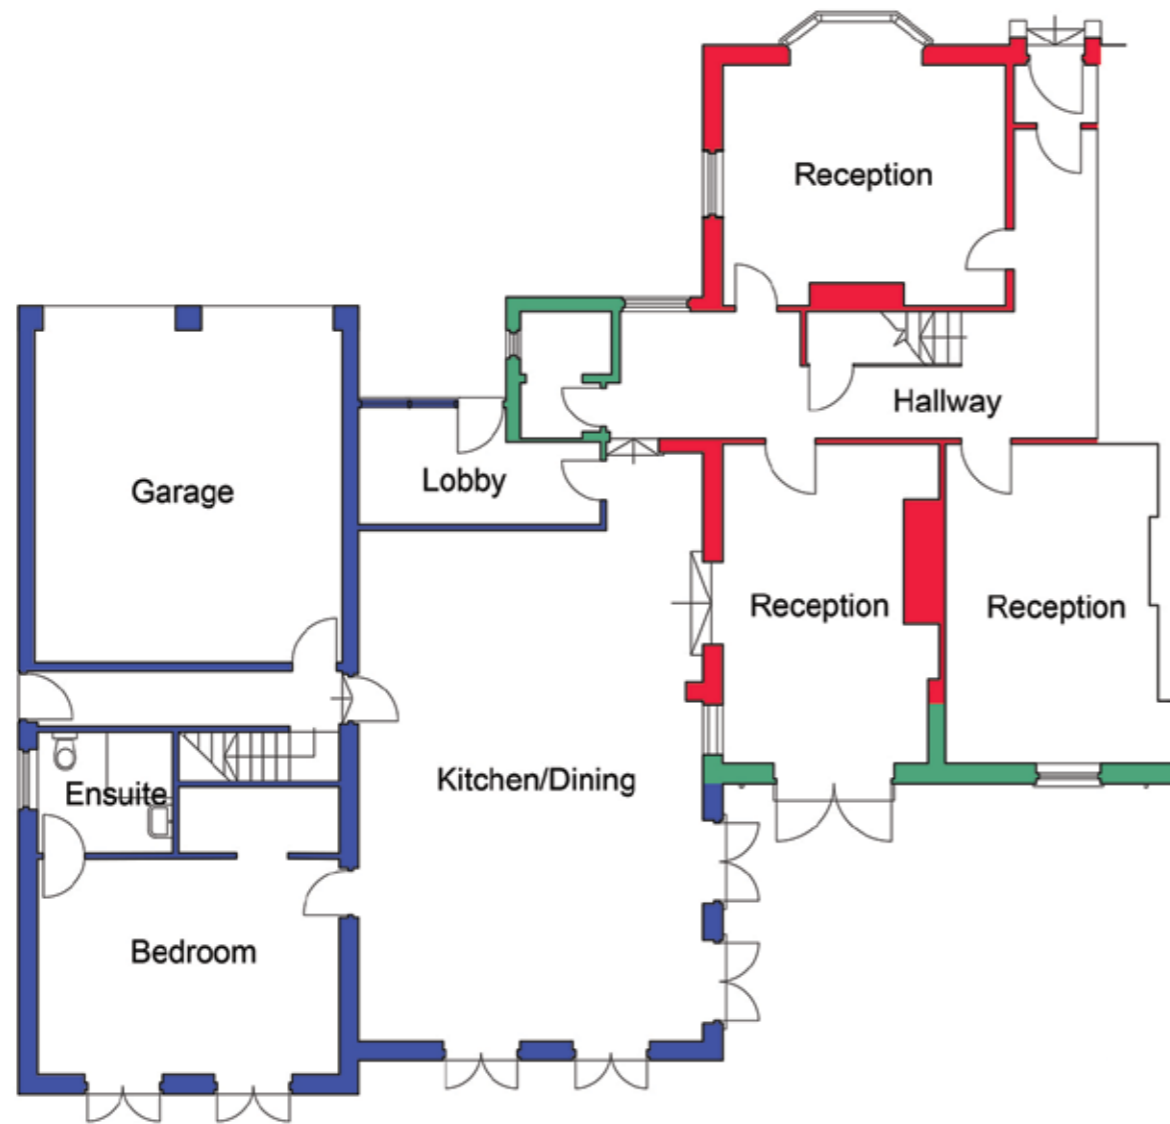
Existing Ground Floor Plan with Historic Phasing
